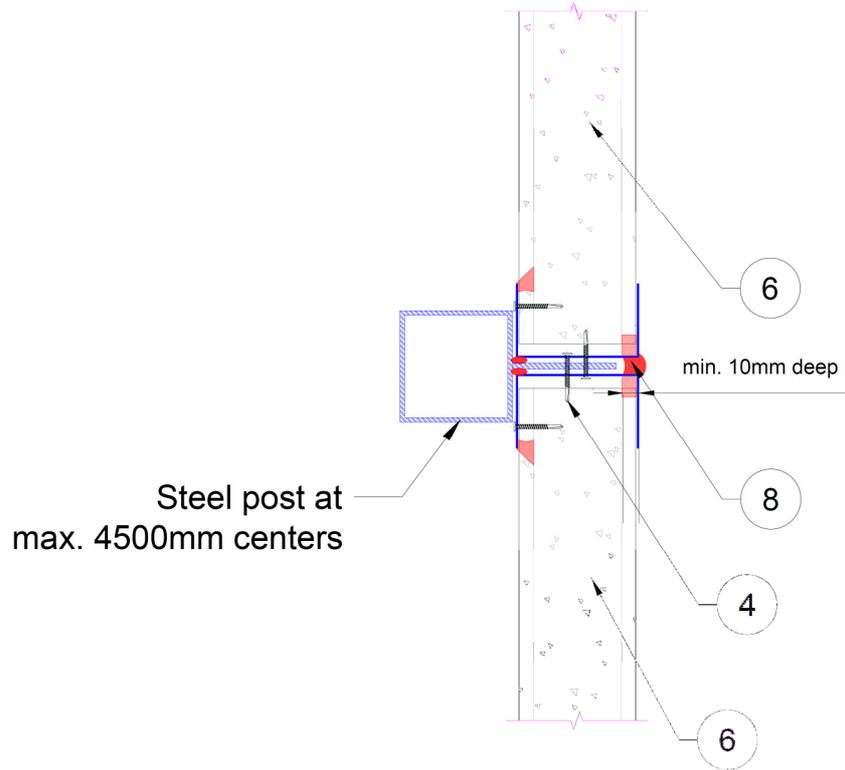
Junction Detail for Horizontal Speedpanel Wall and Steel Post
